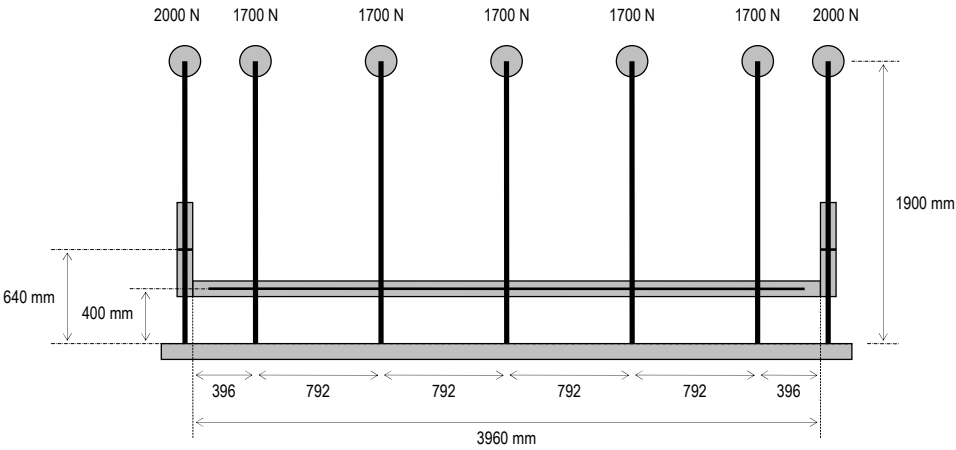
shows the plan view of the arrangement used to impose vertical precompression onto the test walls, consisting of a series of weights suspended from horizontal bars cantilevered over the wall. An elevation view of this arrangement is also shown in Figure 2.7.
